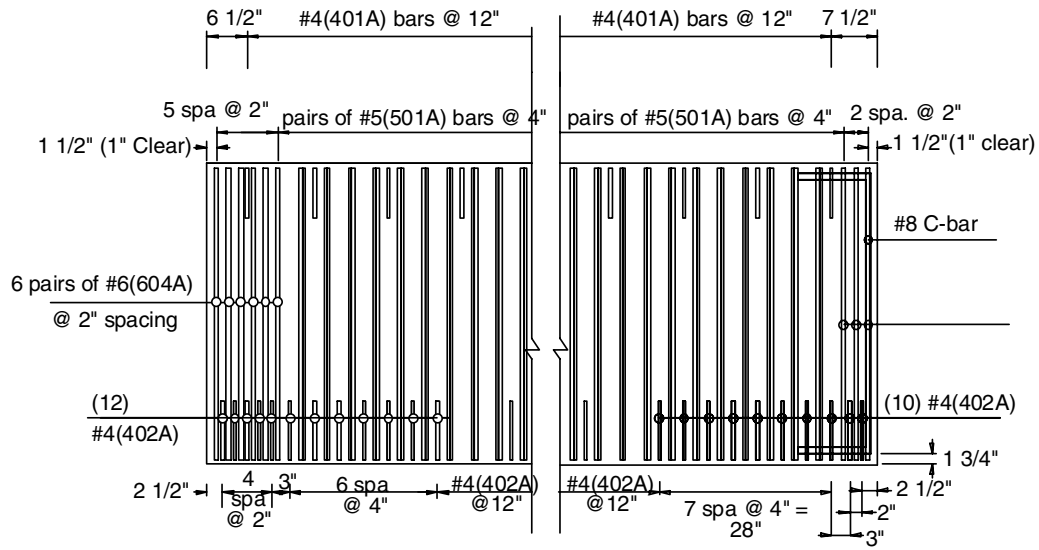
End zone reinforcement details of VA2L (LRFD) and VA2R (proposed).
